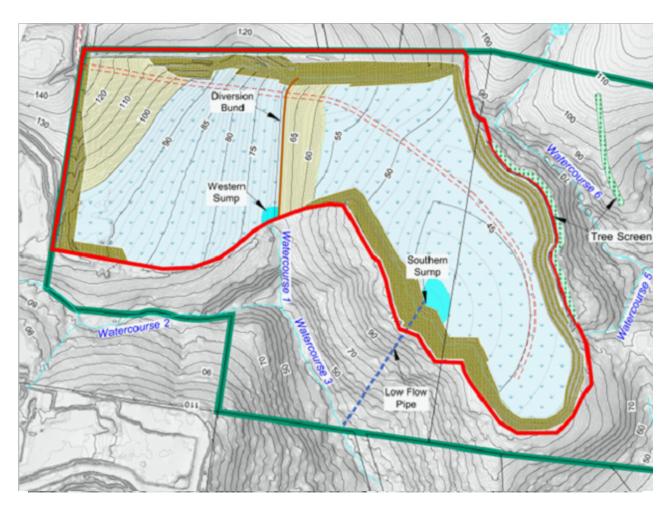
Indicative Final Landform with Outlet Pipe (Source: RWCorkery & Co)
